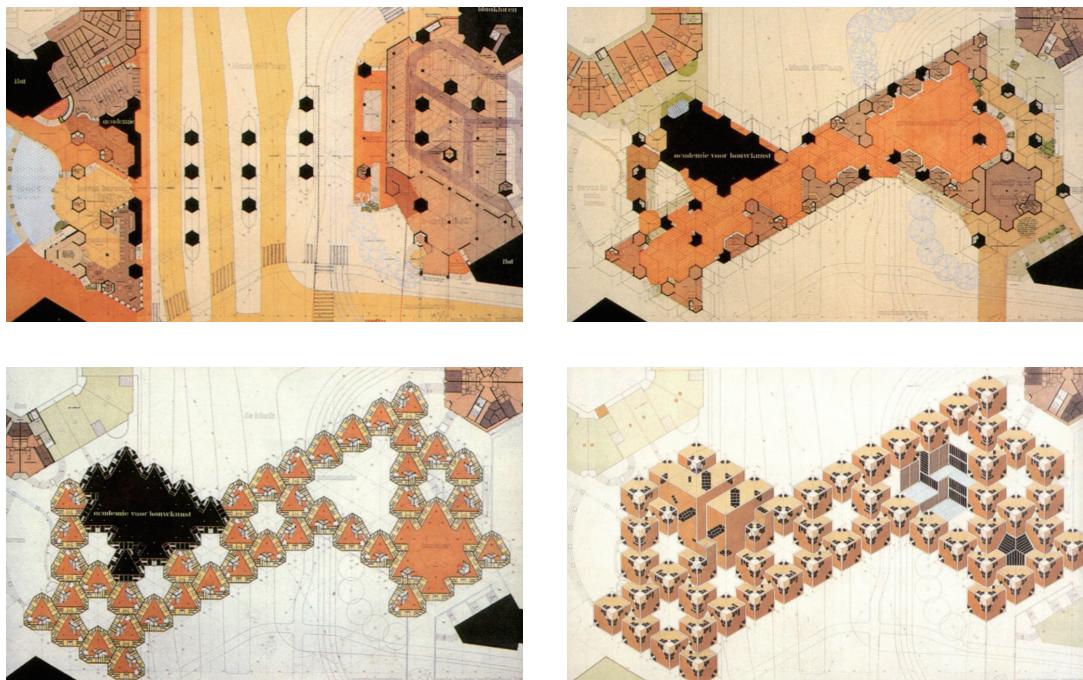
Floor plans of cube house in Rotterdam (Piet Blom, 1978-1984. ArchDaily accessed April 8, 2021 <https://www.archdaily.com/482339/ad-classics-kubuswoningen-piet-blom>)
